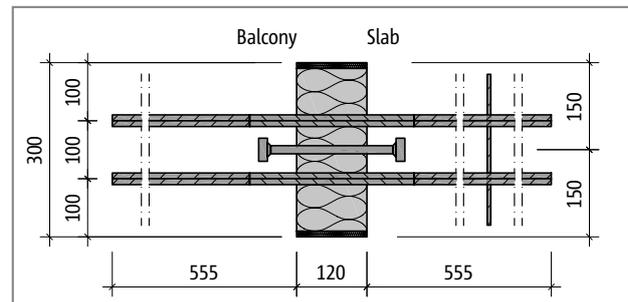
Schöck Isokorb® XT type Q-P-VV1: Product plan view
